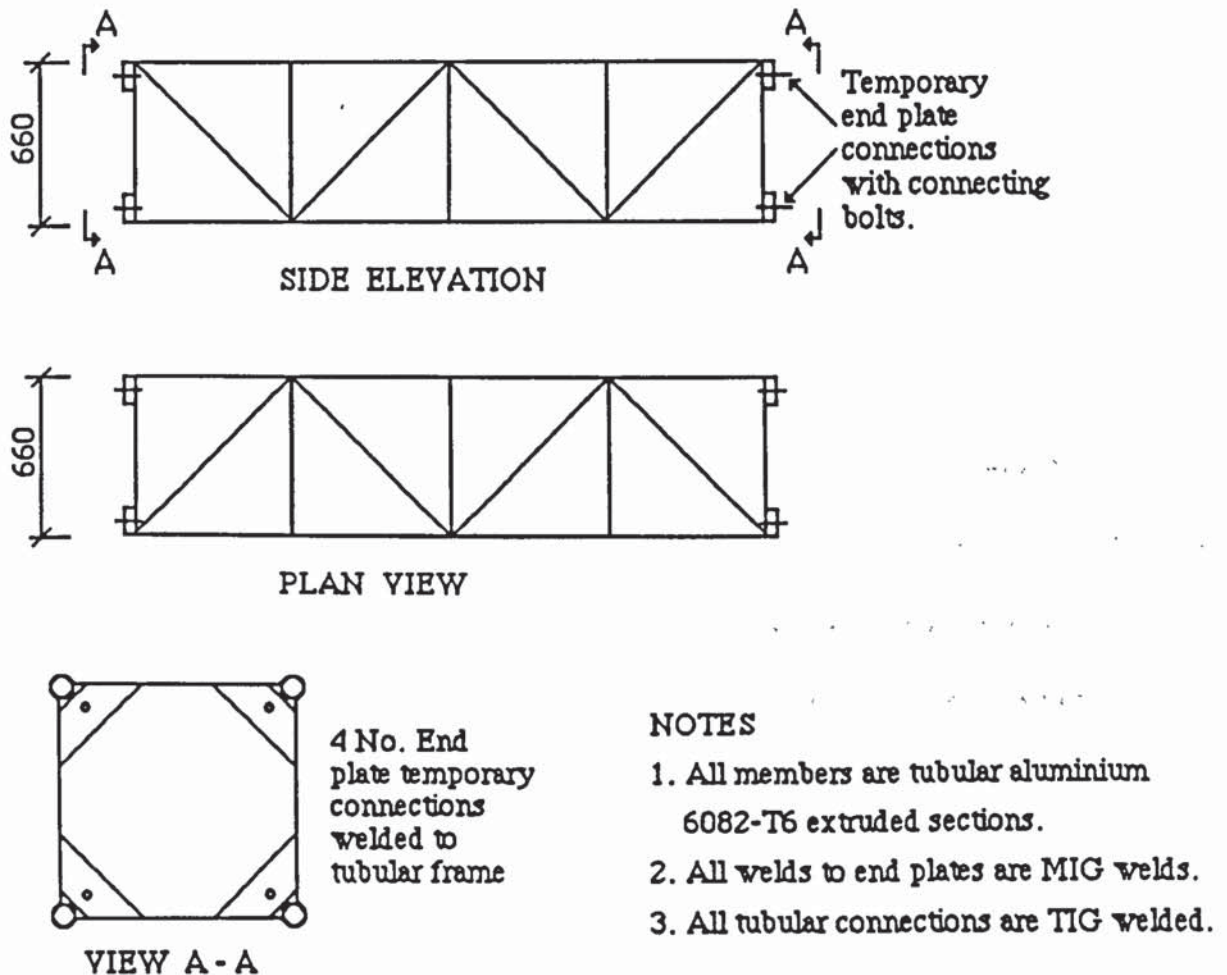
General arrangement of a space frame with temporary end plate connections.
